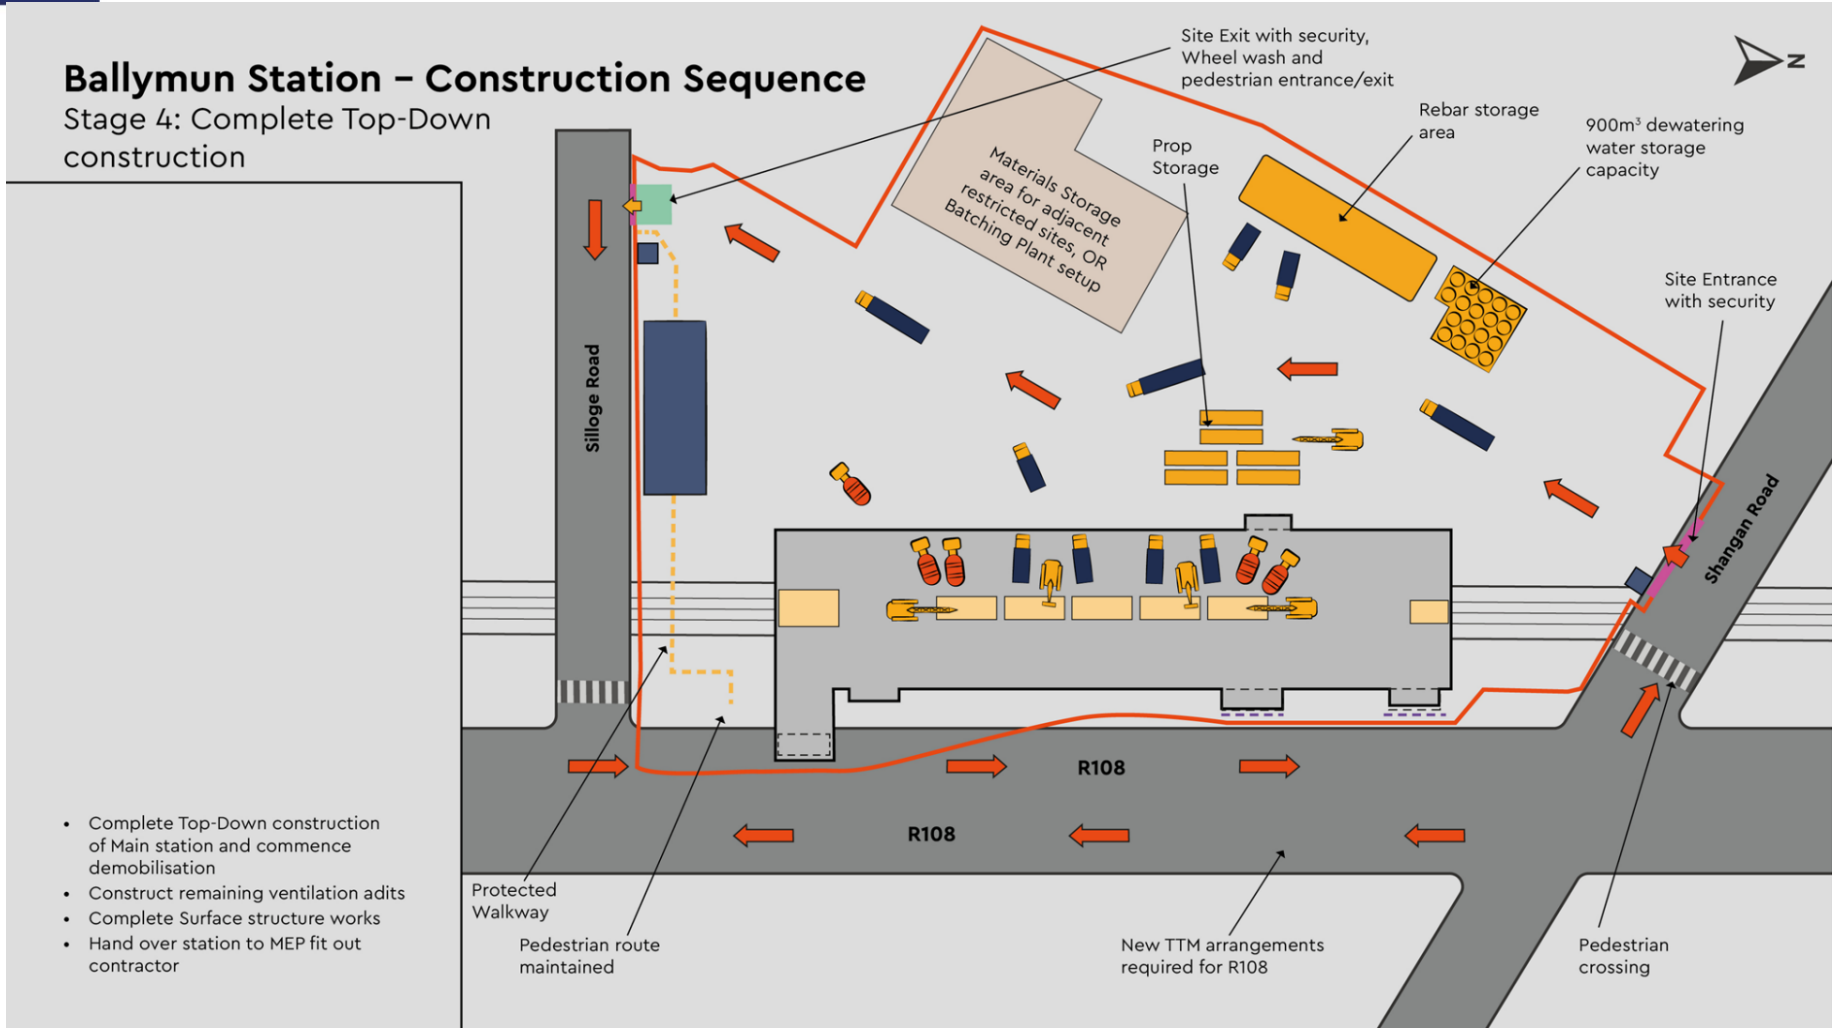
Ballymun Station Stage 4 – Complete Top-Down Construction
